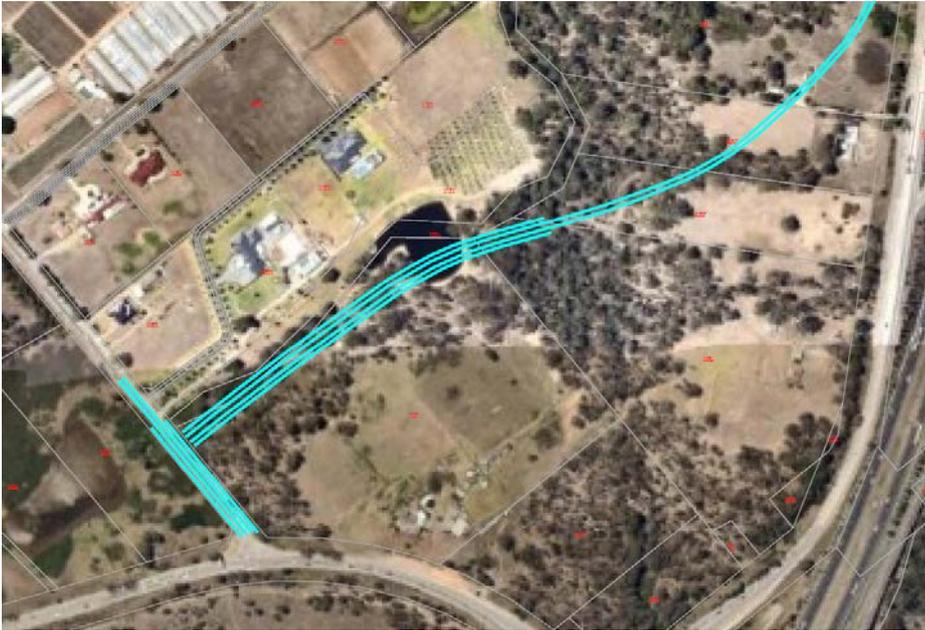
Further refined Option 1 of Strategic Wallgrove Road/Cecil Road realignment options
